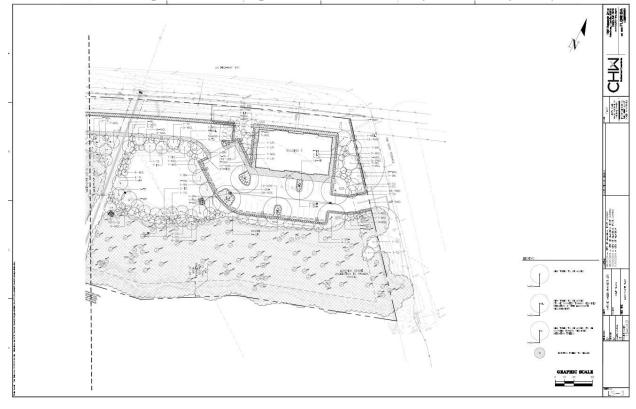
Proposed Landscape Plan for Golf Plaza (Sheet 2 of 2)
